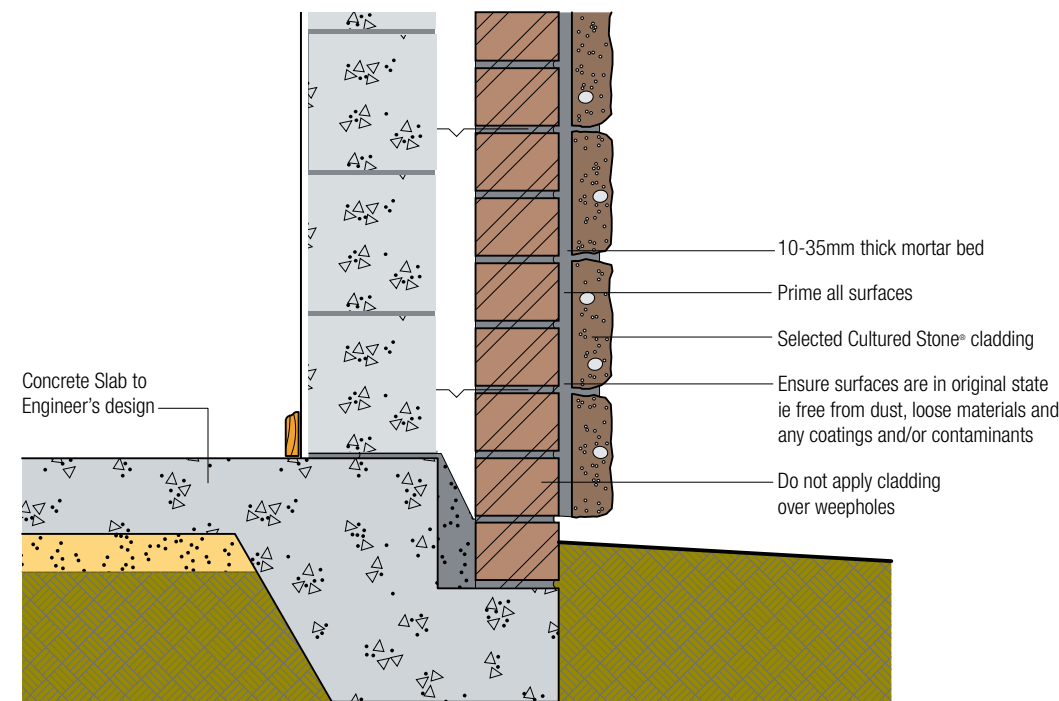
Brick or Block Work Base - Section (Dwg # CS-04.02)
